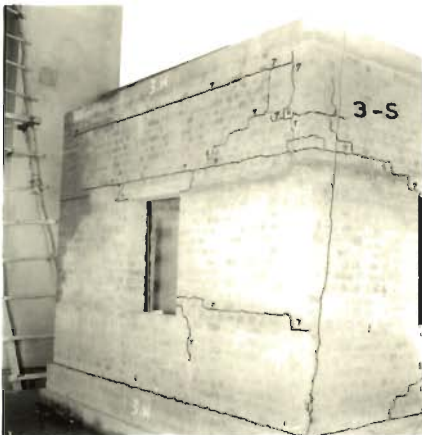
\_ CRACKS IN SOUTH AND WEST WALLS ( MODEL 3 )
